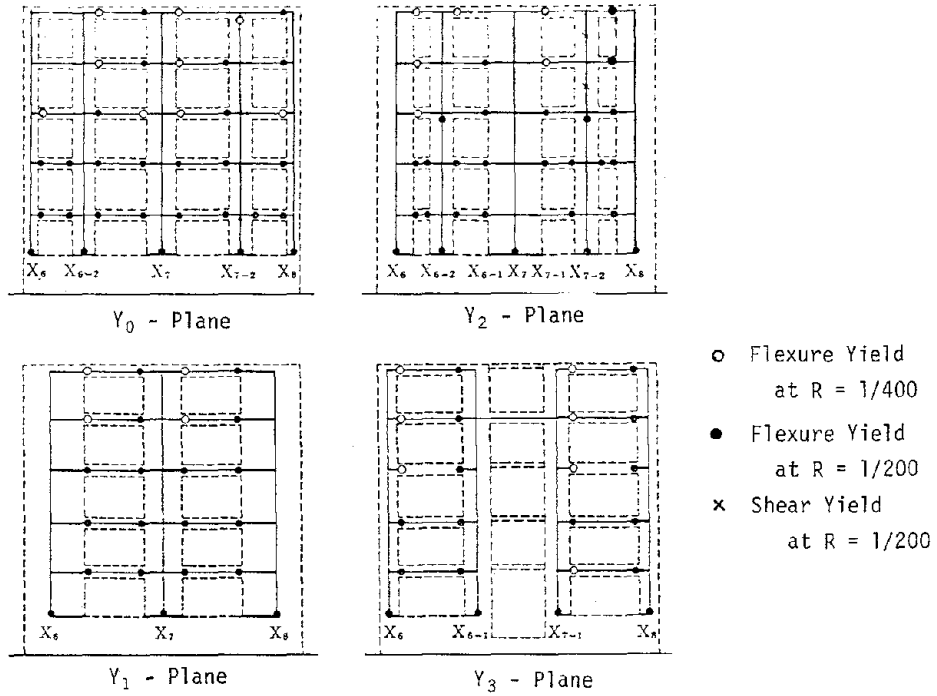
FAILURE MECHANISM DUE TO POSITIVE LOADING
